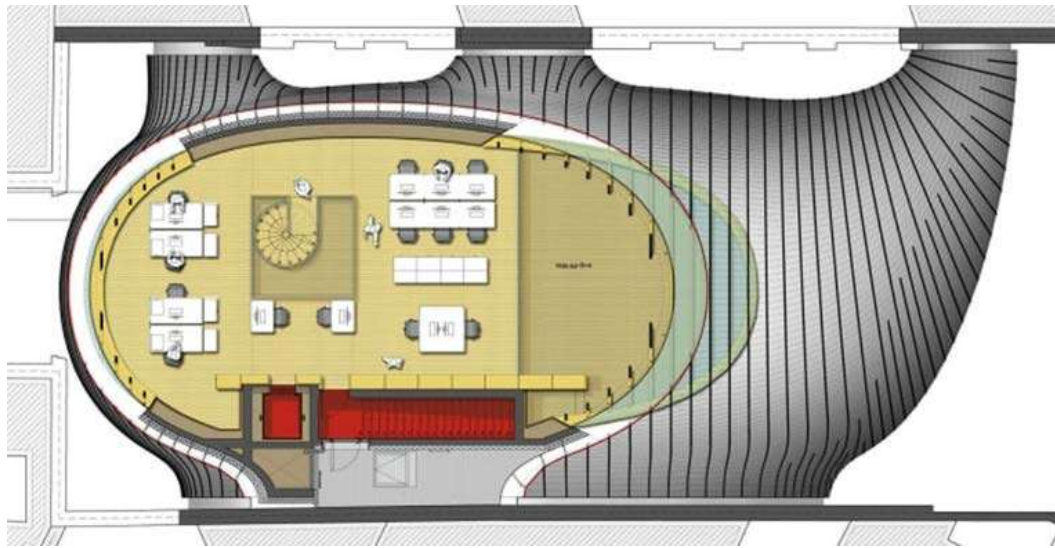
Pathe Foundation, Renzo Piano, Paris, France: Fifth Floor Foundation (10)
